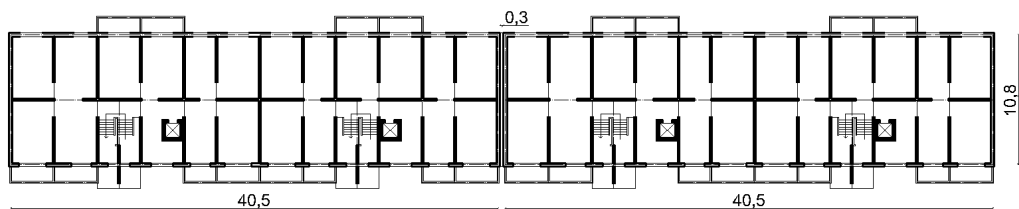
Plan view of buildings 25 and 4/1, showing the adjacent block. In our assumption, a connection 30 cm wide is present between the slabs at each floor.
